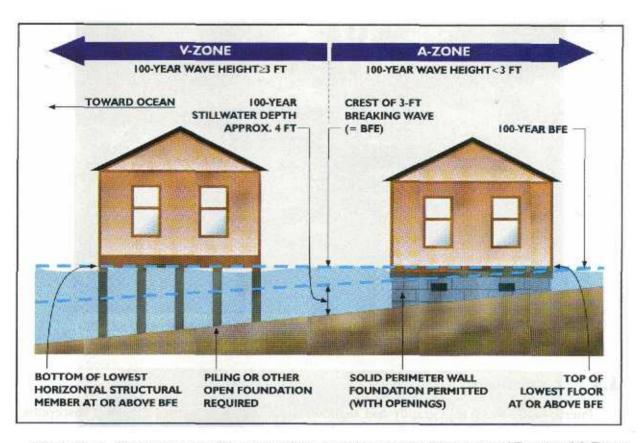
Comparison of building foundation and elevation requirements in V-Zones and A-Zones.
